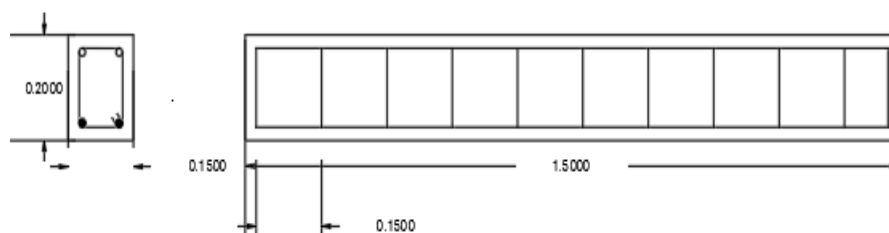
Sectional View of concrete beam (all dimensions are in meter).
